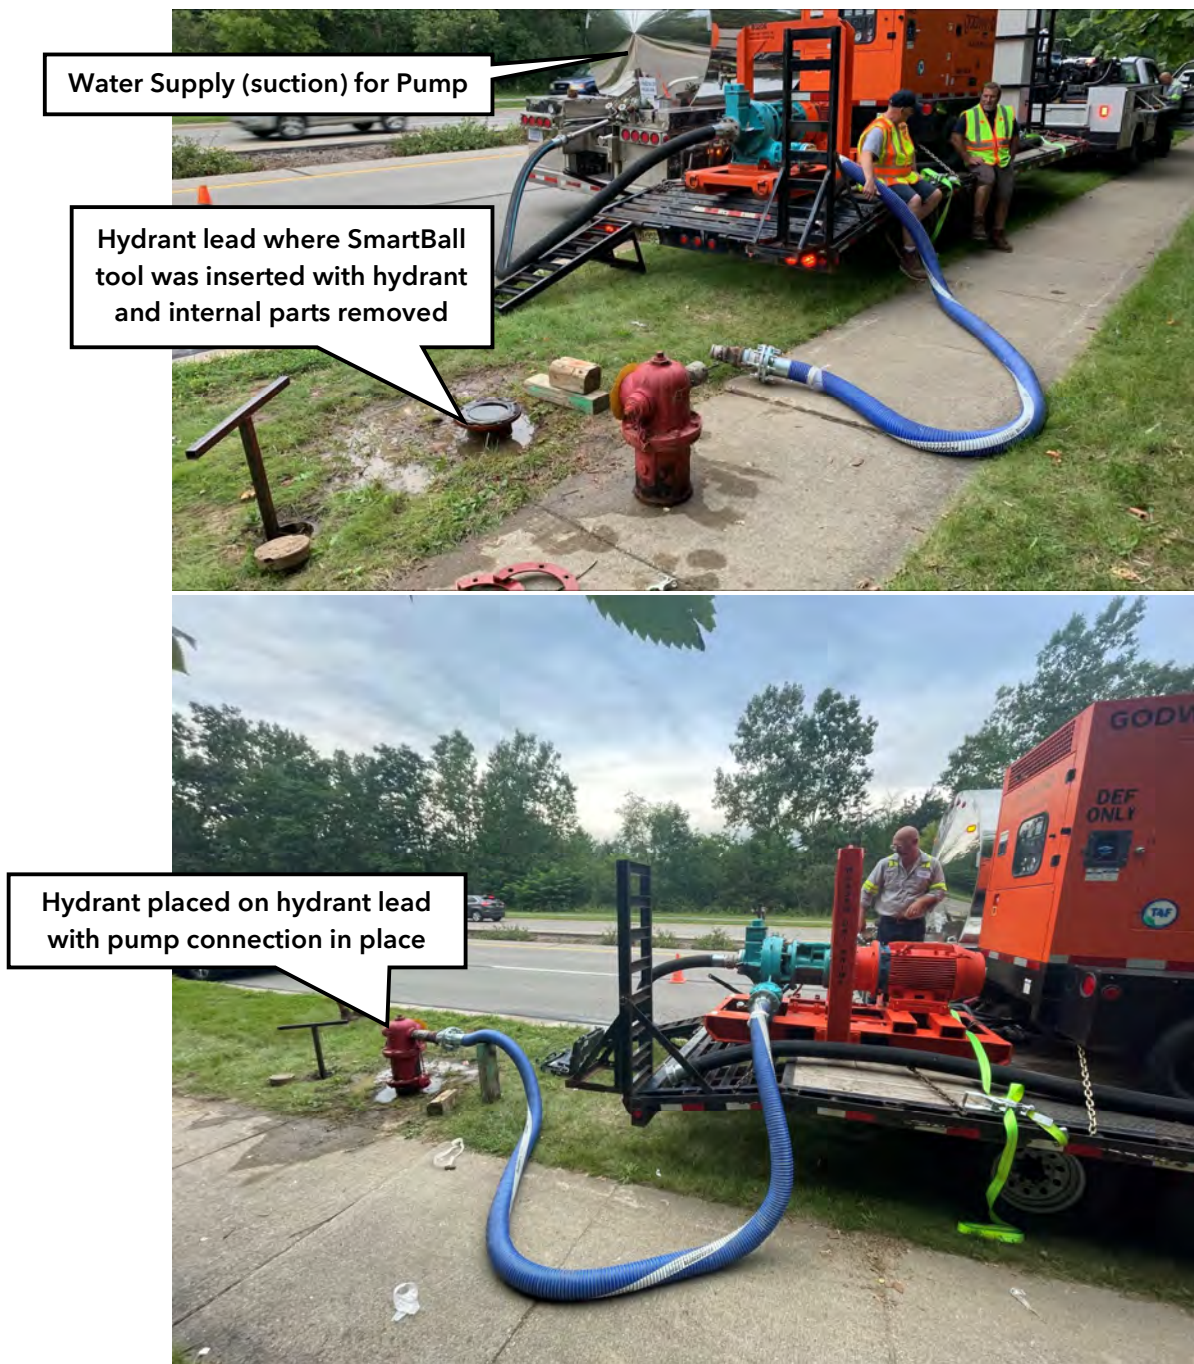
View of SmartBall Insertion Location, Pump used to push SmartBall Tool into the Main
